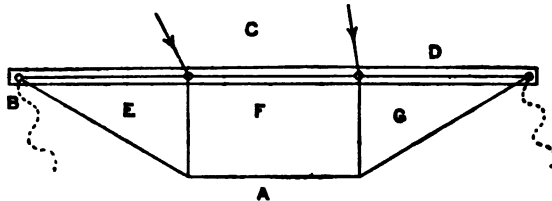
FRAME DIAGRAM FOR A TRAPEZOIDAL TRUSS.
